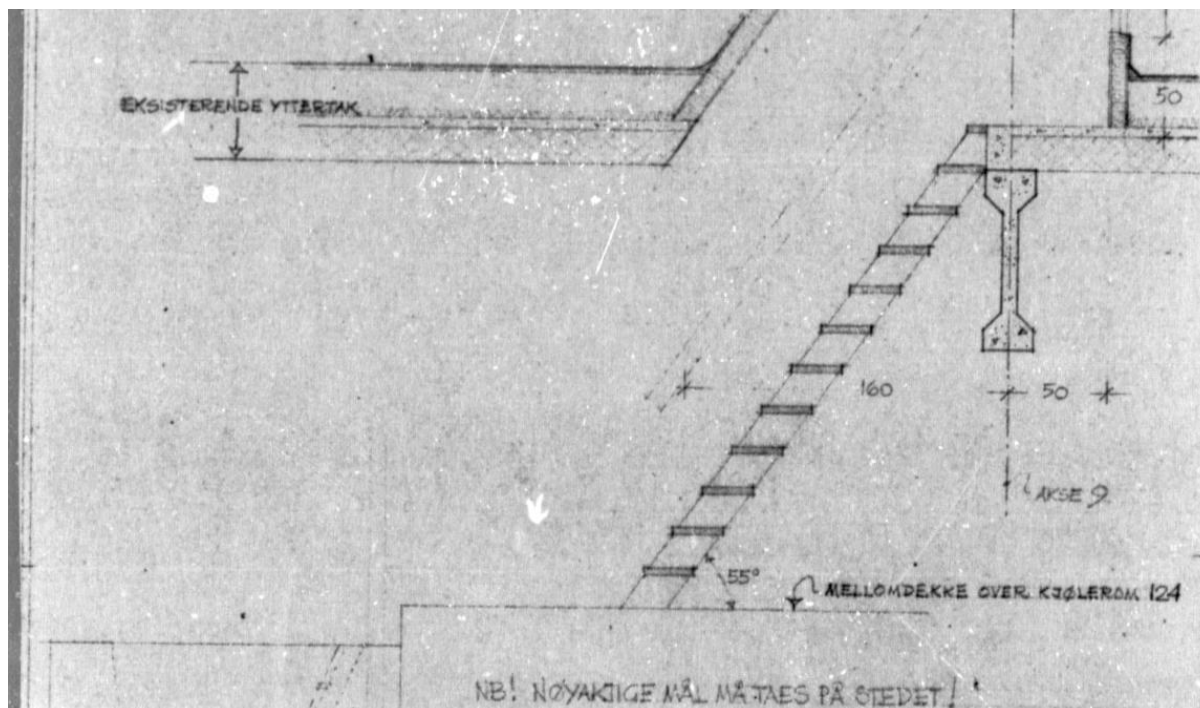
Original drawing where the cross section of the I-shaped prestressed beam is shown.
